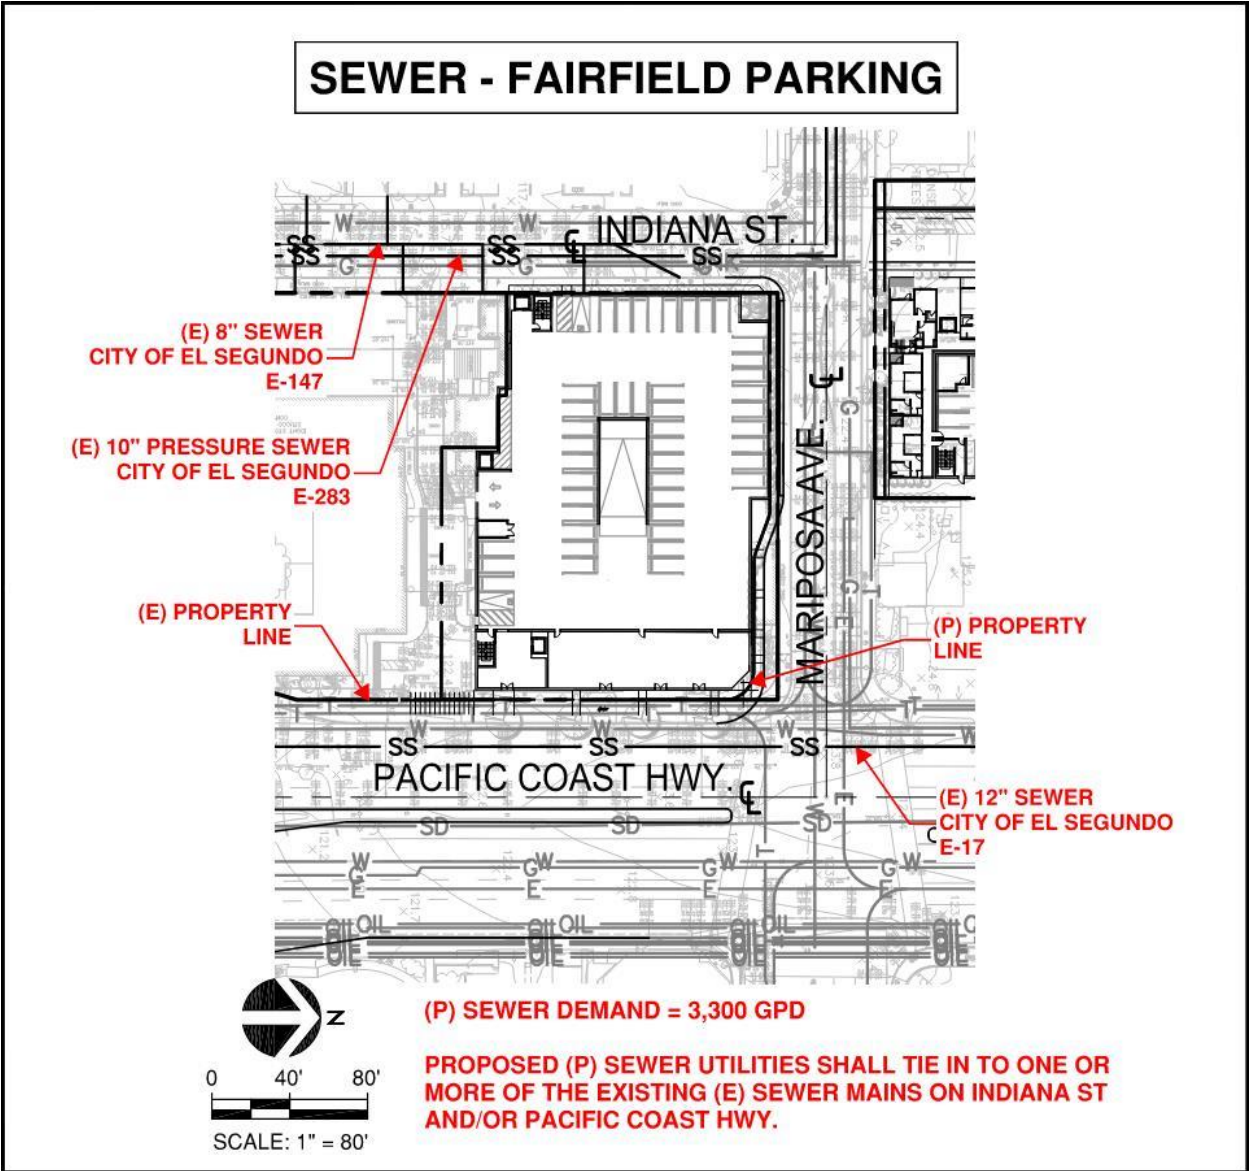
A CONCEPTUAL SEWER PLAN SOUTH SITE IN THE PCC MU-1 DISTRICT
